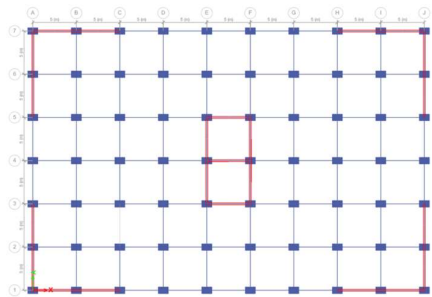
Bare frame model having shear wall along X and Y-direction and core wall at center
